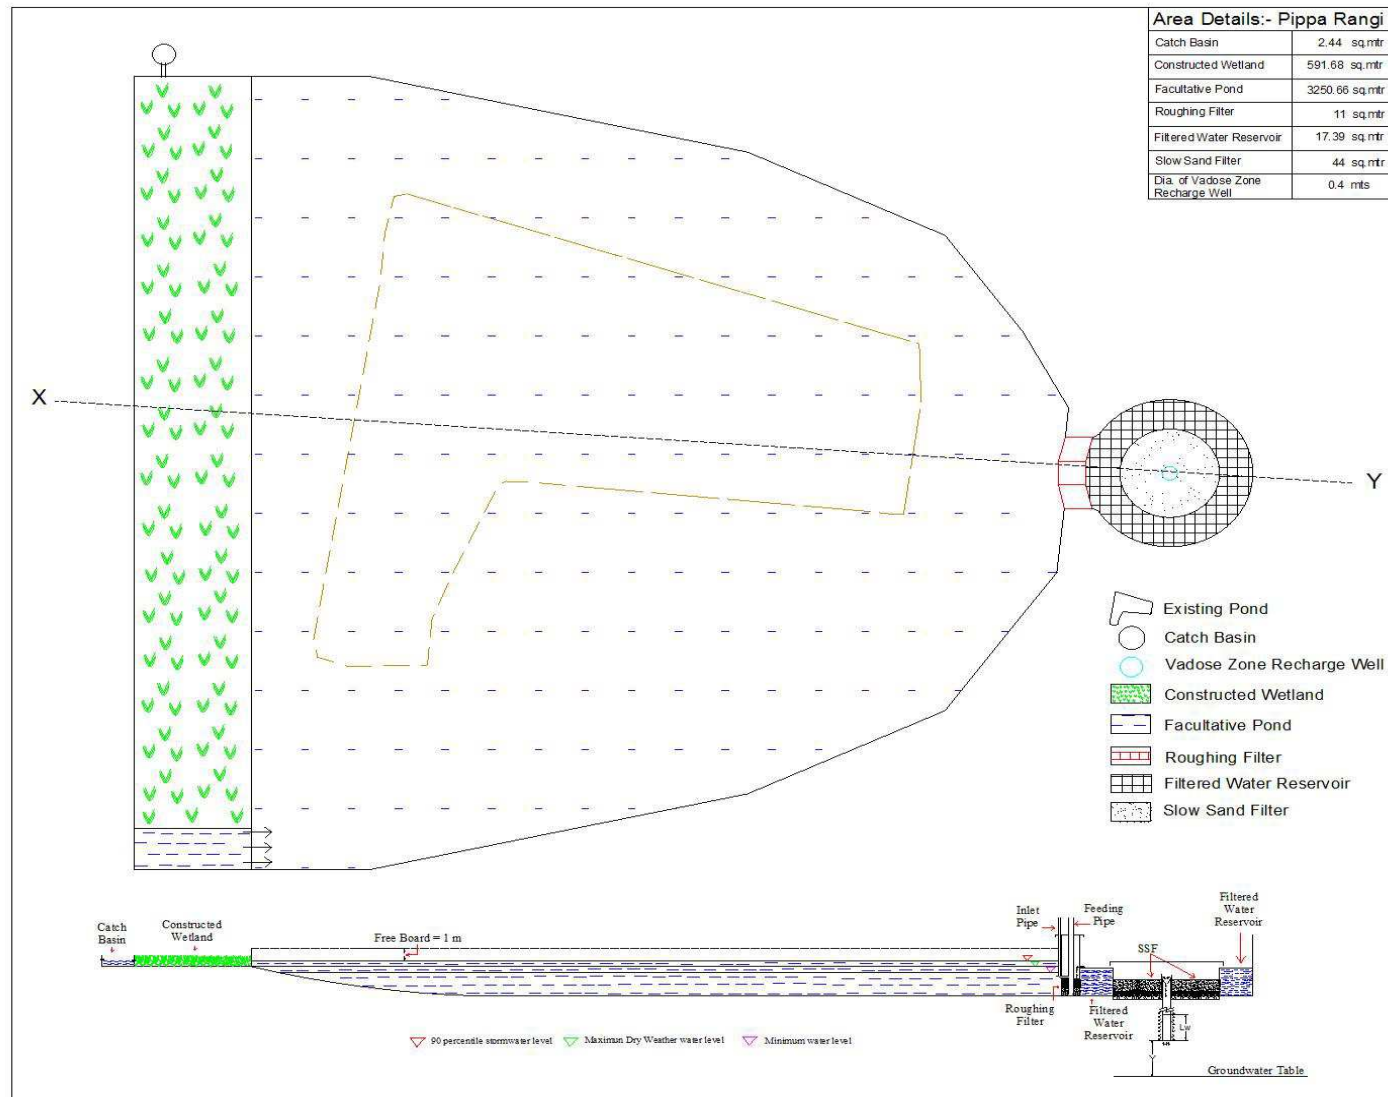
Plan and elevation view of Pippa Rangi village pond system
